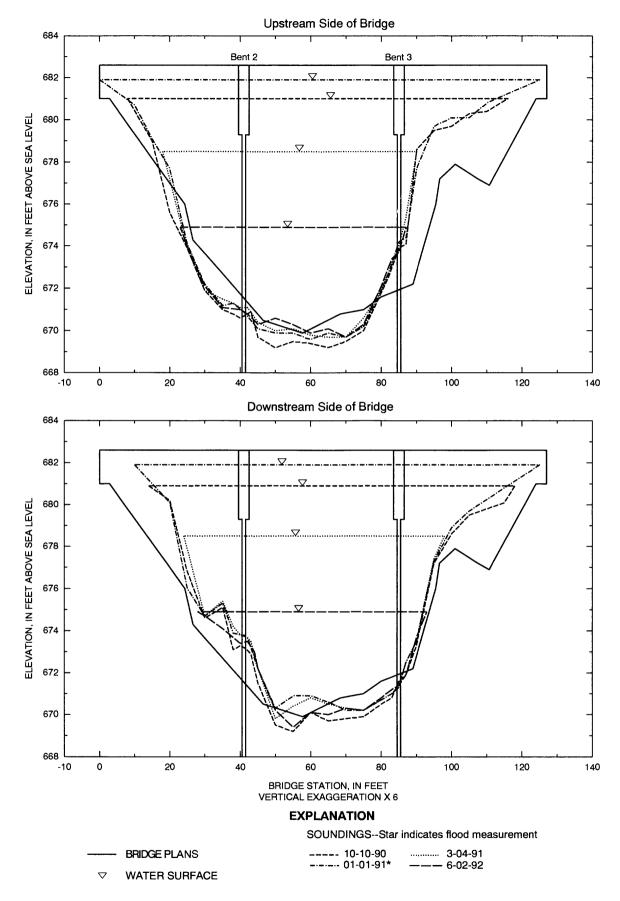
Cross sections showing bed elevations from bridge plans and soundings, U.S. Route 35 over Kankakee River at Union Center, Indiana.
